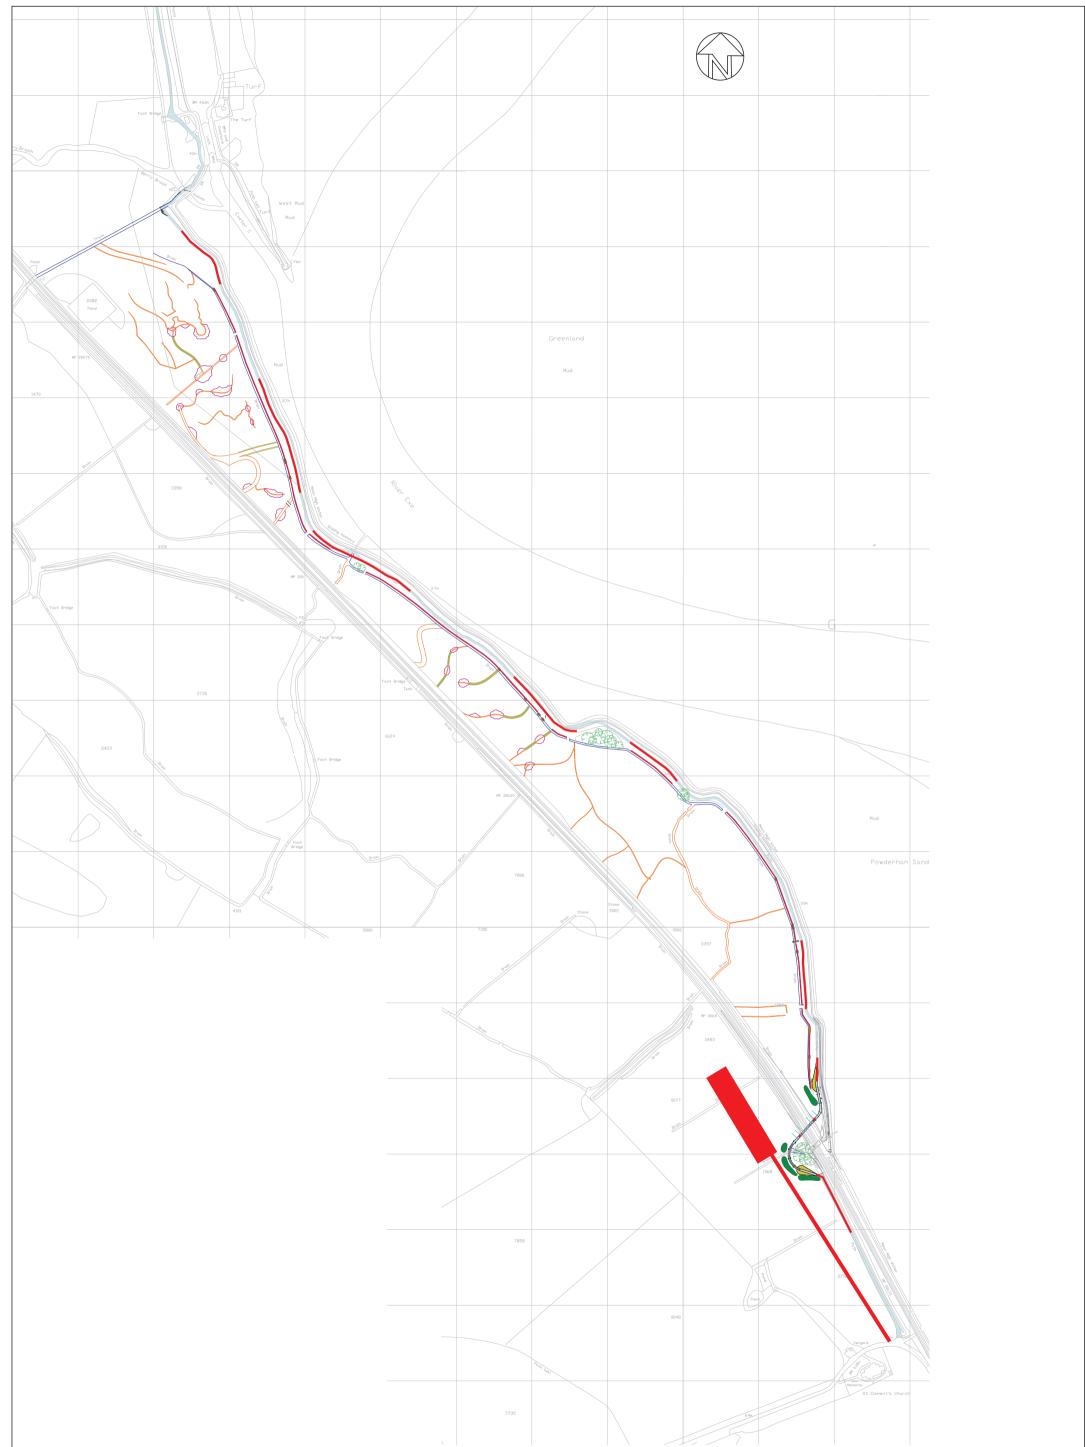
Site location showing extent of groundworks and watching brief areas (red).
